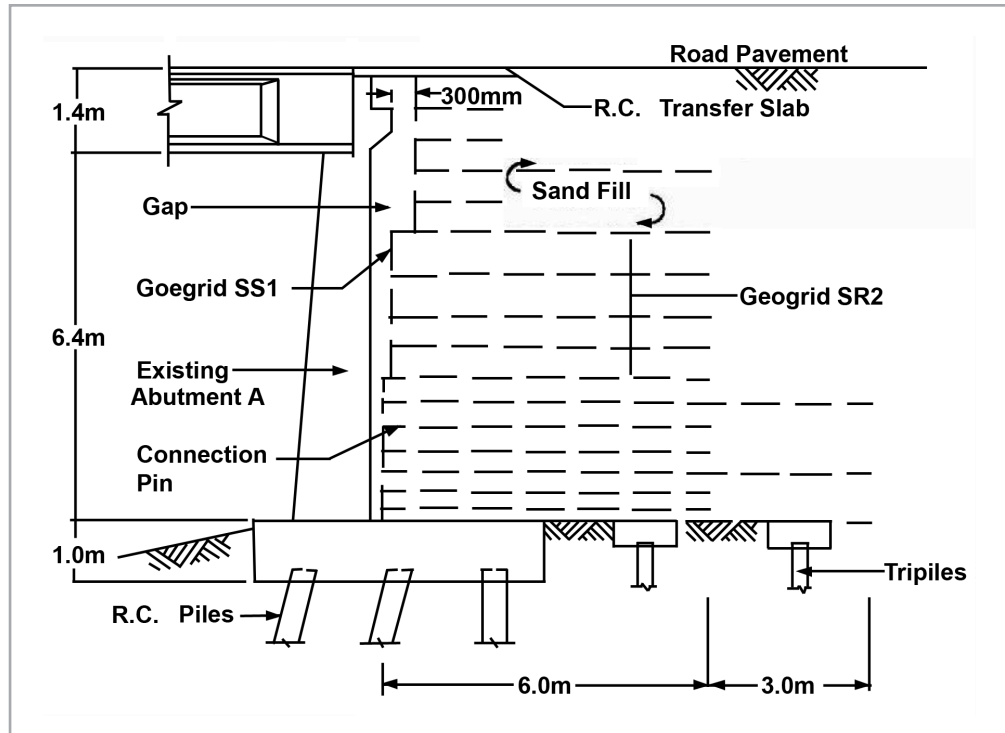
Shah Alam Bridge Abutment Failure, Selangor (after Chan, 2000)
